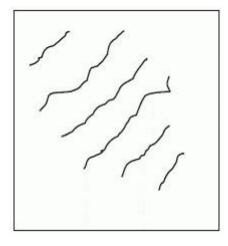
Shrinkage Cracks Appear on Slabs are Parallel to each Other
